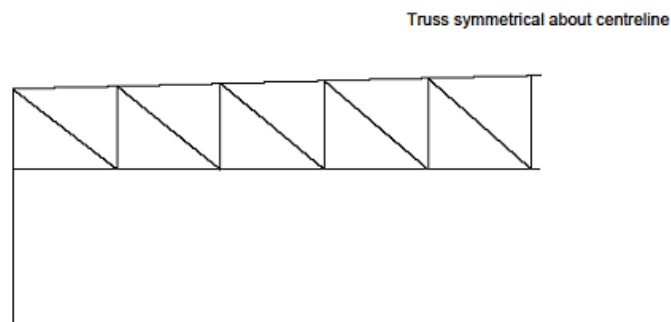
a. The truss arrangement as shown on the structural engineer's drawing.
